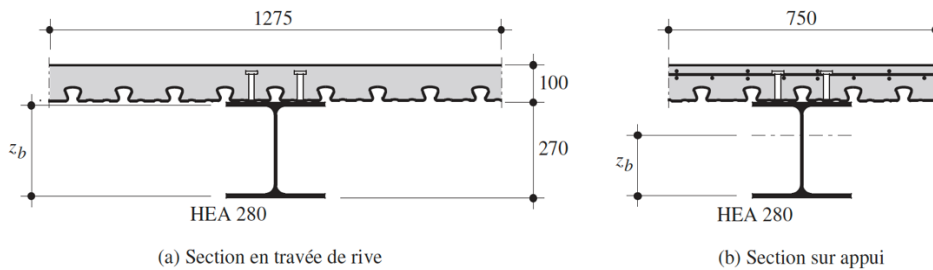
Cross-sections of the continuous mixed beam in span and on supports.
